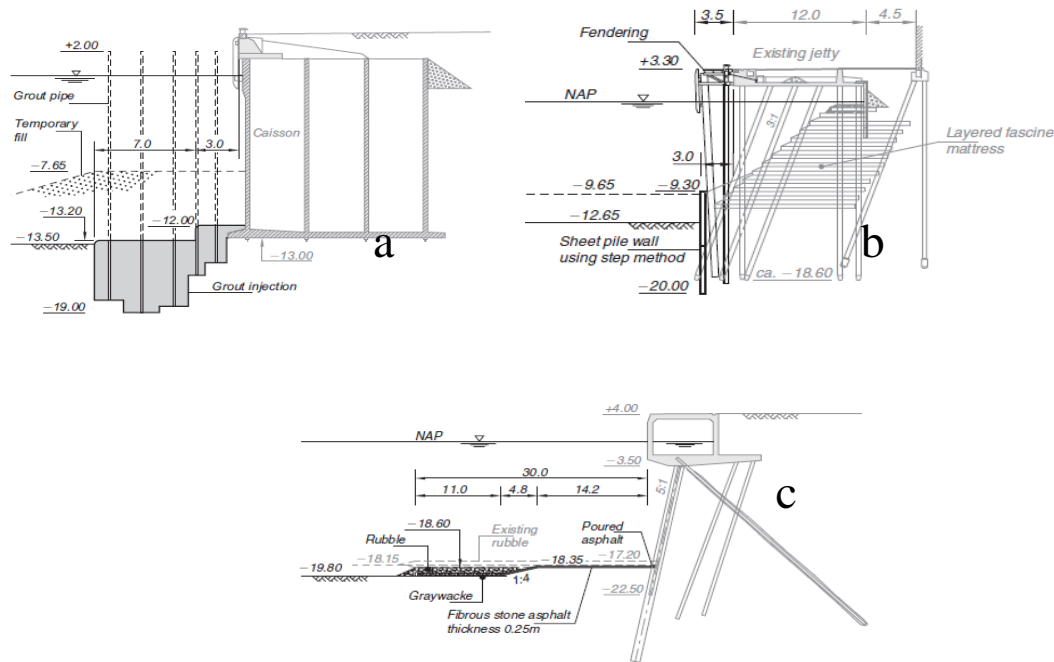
a) protection of erosion and restoration the stability with a grout body added to the toe of the caisson, b) wall safeguardation the stability of the layered fascine mattress with a short staggers sheet pile wall, c) An open textured fibrous stone asphalt mattress is used to increase the depth of this quay (Broeken and De Gijt, 2014)
